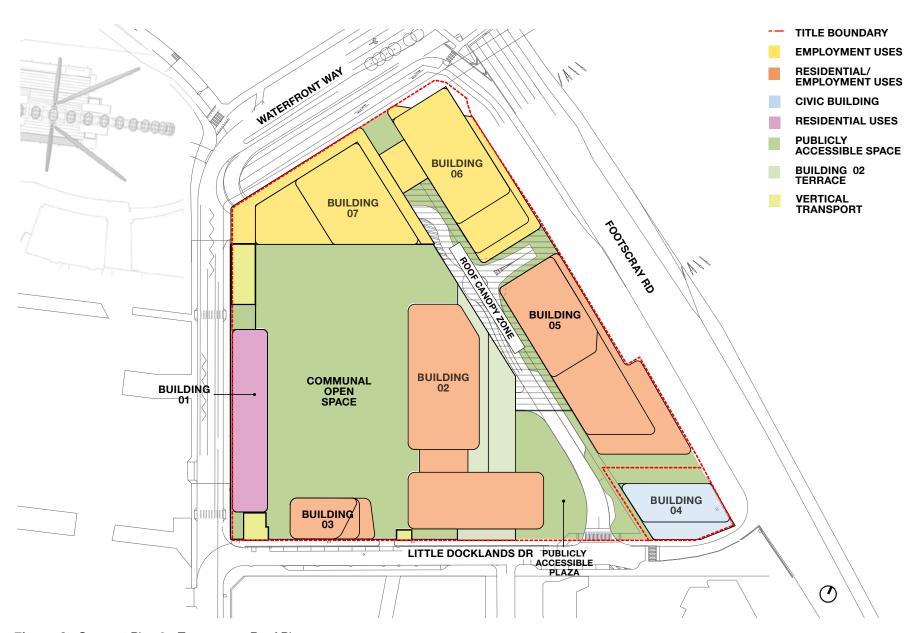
Concept Plan 2 - Tower uses, Roof Plan
